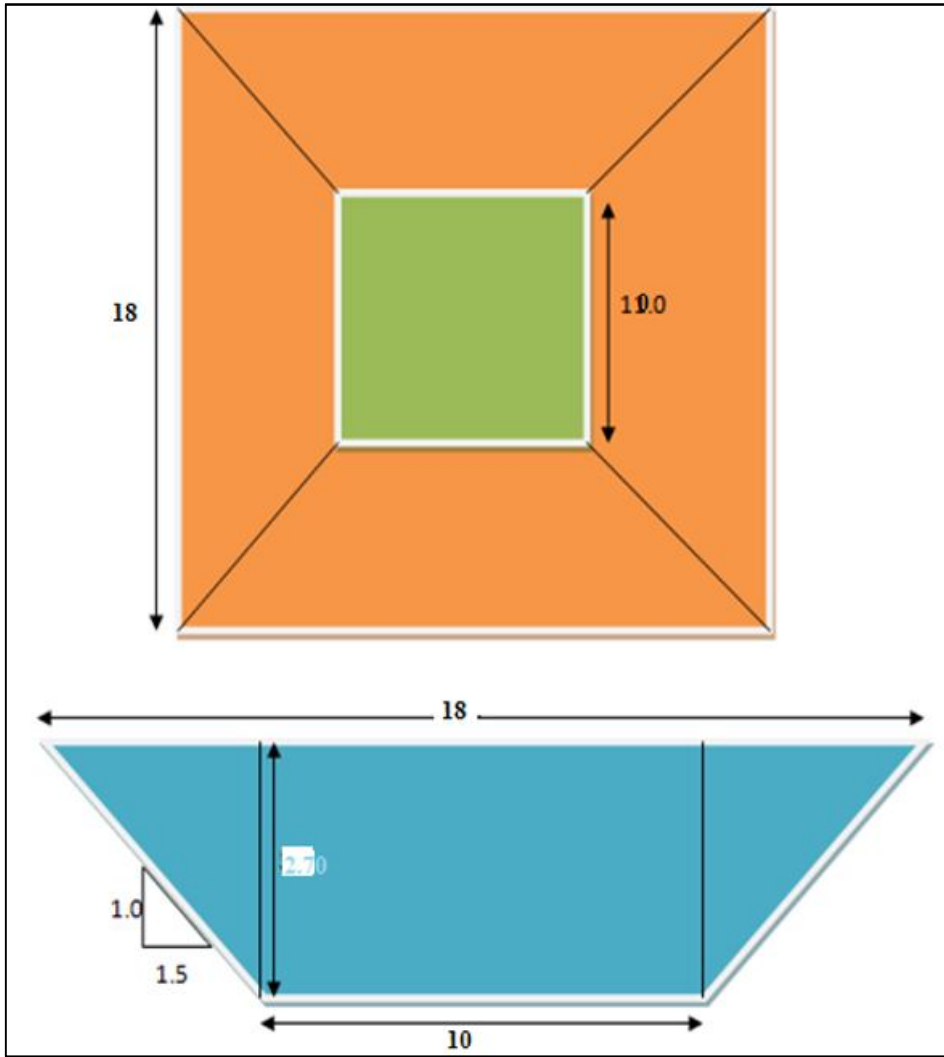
Plan and sectional view of Farm Pond showing design dimensions
